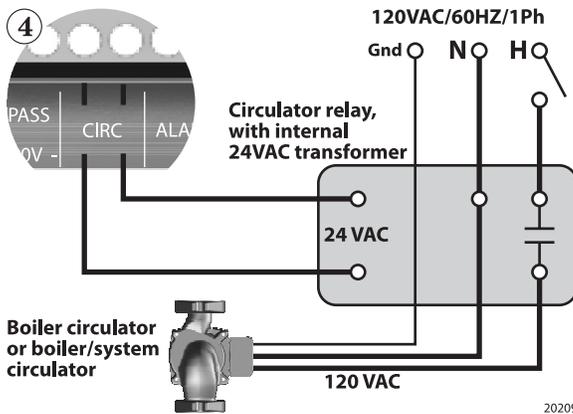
Wiring the boiler circulator using a relay or starter (required for motors over 1/4 hp)
